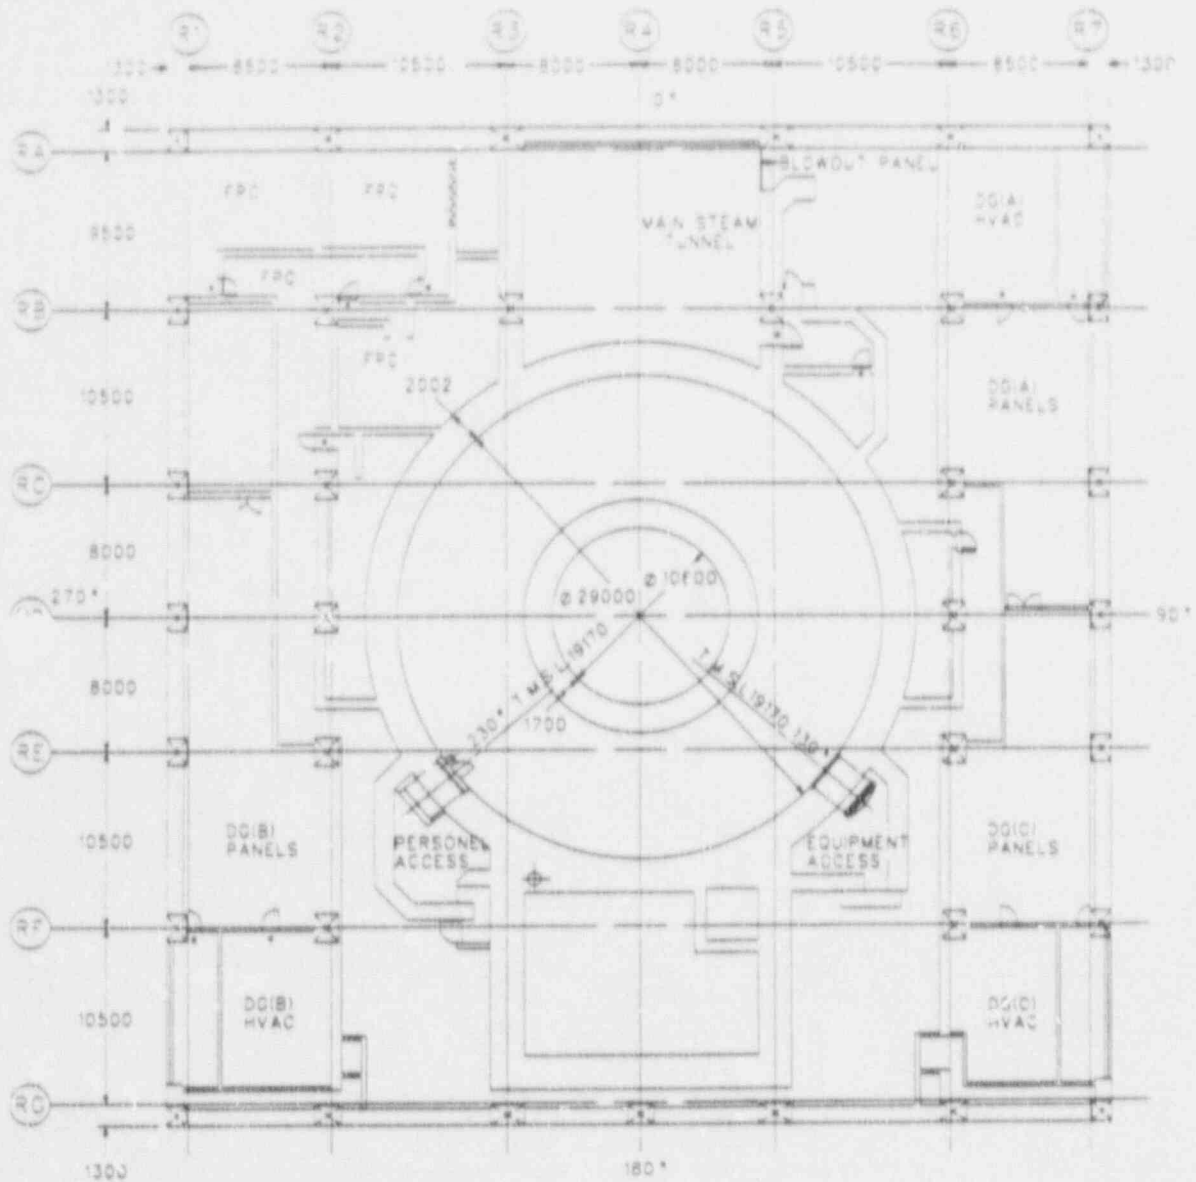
Reactor Building Arrangement—Elevation 8500 mm
